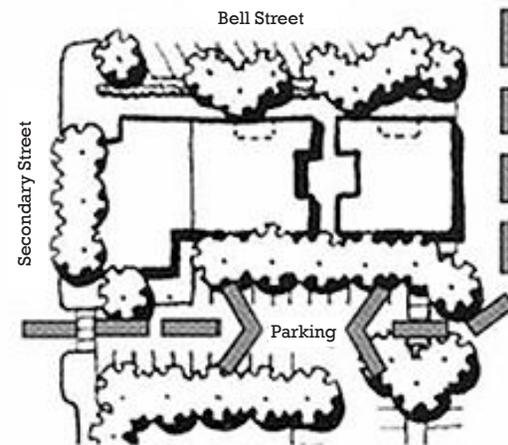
Conceptual diagram with continuous facade along a block, some angled parking in front with parking lot in rear of buildings
